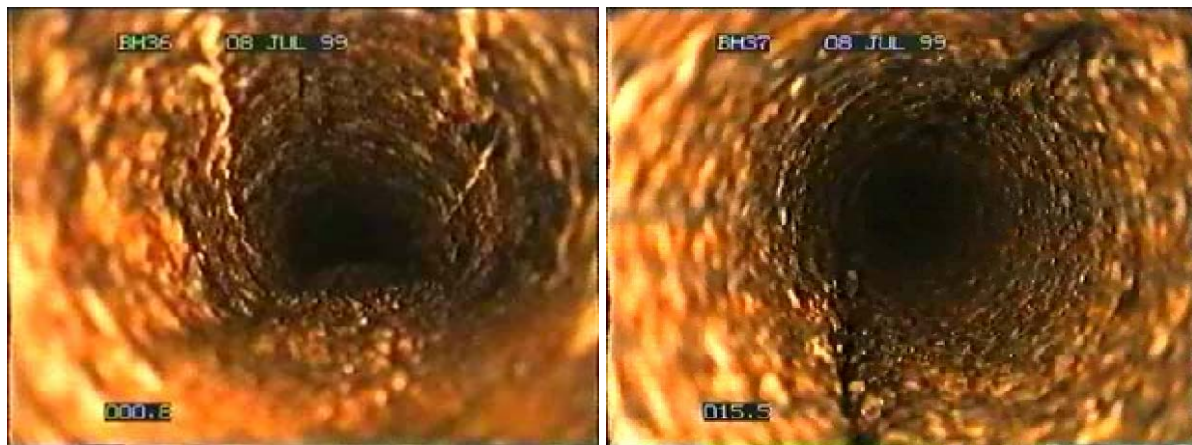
(Left) Drill cutting shown at the bottom of a grout hole, which has not been sufficiently cleaned before grouting. (Right) A wide open non conductive joint in a grout hole.
